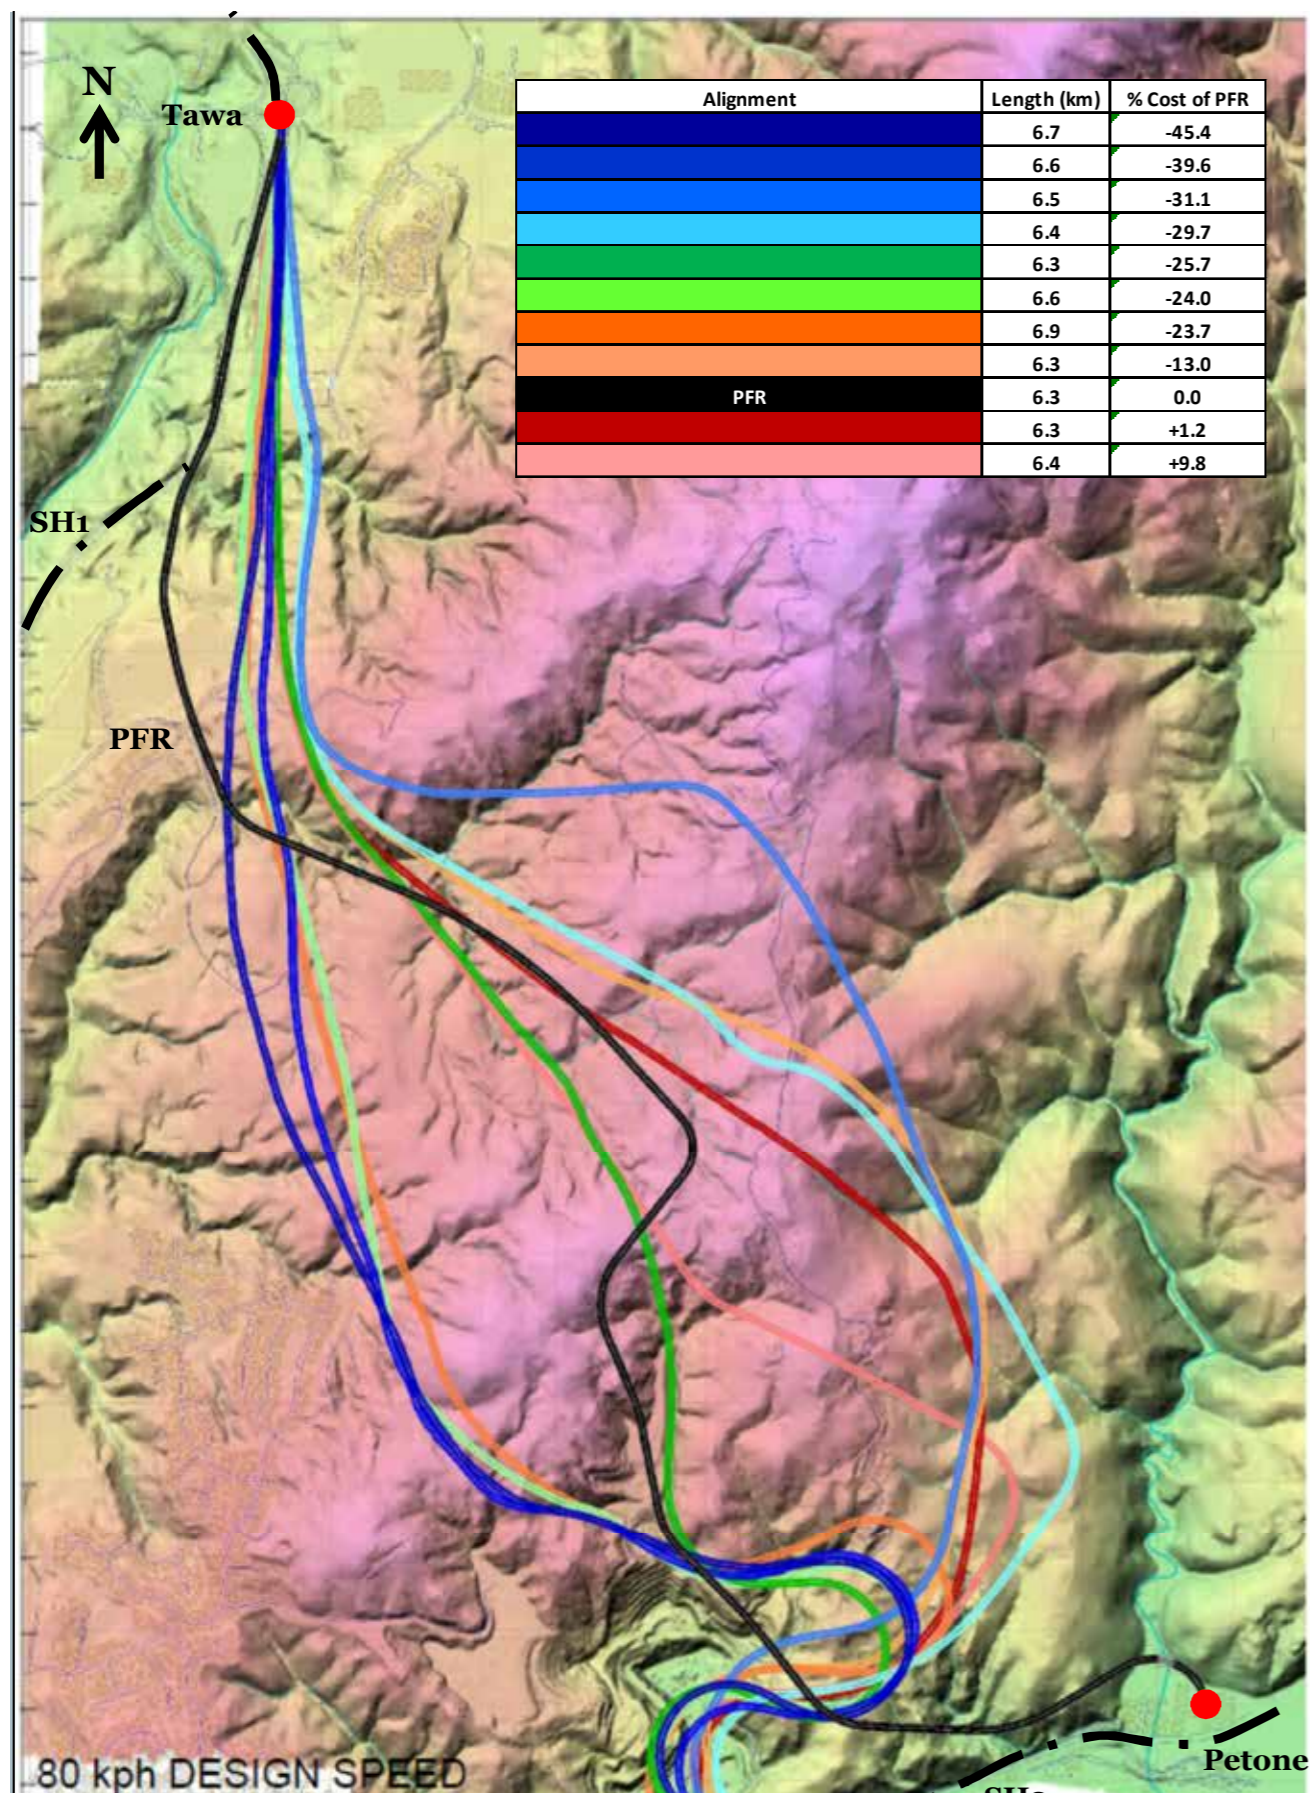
Alternative Connection 3 – SH2/Horokiwi Road
